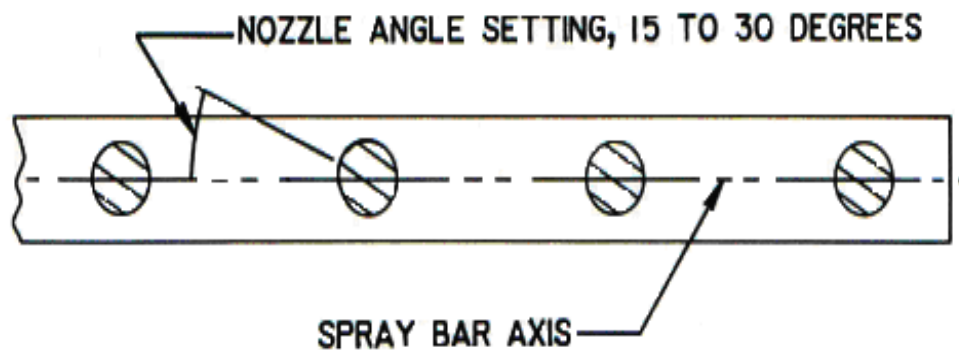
Spray Bar with Nozzle Arrangement (McLeod, 1969)
